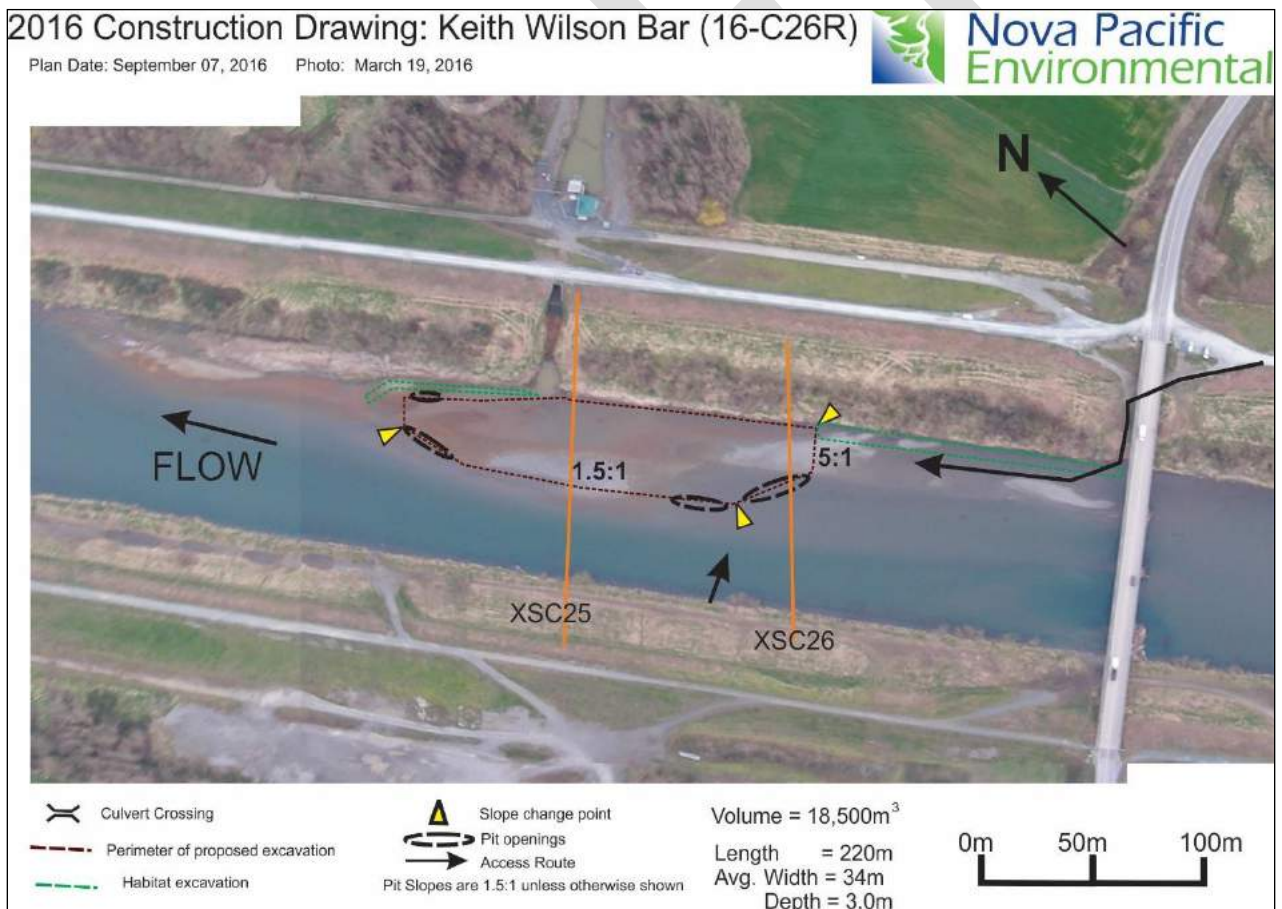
2016 Keith Wilson Bar (16-C26R) construction drawing. Photo taken March 19, 2016, drawing – September 7, 2016.
